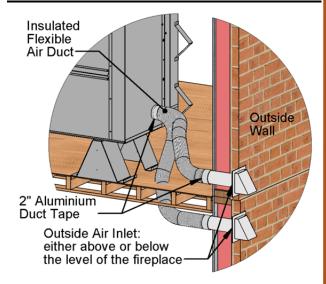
OUTSIDE AIR CONNECTION AND INSTALLATION EXAMPLE
